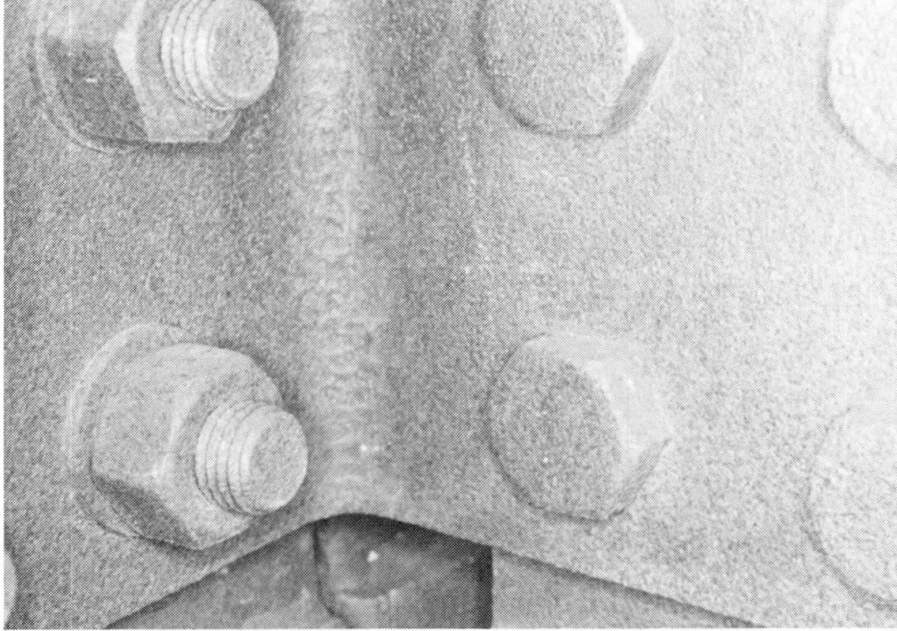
Fatigue Crack in Longitudinal Girder-Beam (Bent) Angle Connection
